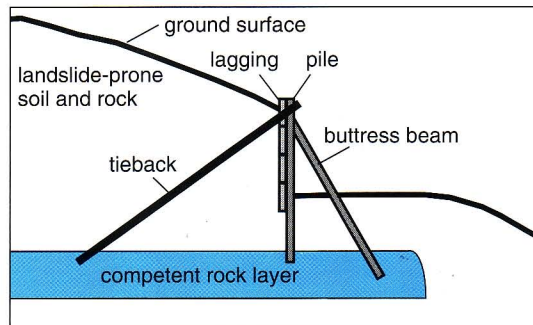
Diagram of a retaining wall with tiebacks and buttress beams. Tiebacks are metal rods that extend from the piles to a competent rock layer below the ground surface. Buttress beams are metal beams that are inclined downslope from the piles that prevent the piles from toppling. Lagging consists of wooden, metal, or concrete beams placed upslope and between the piles to fill in the gaps.
